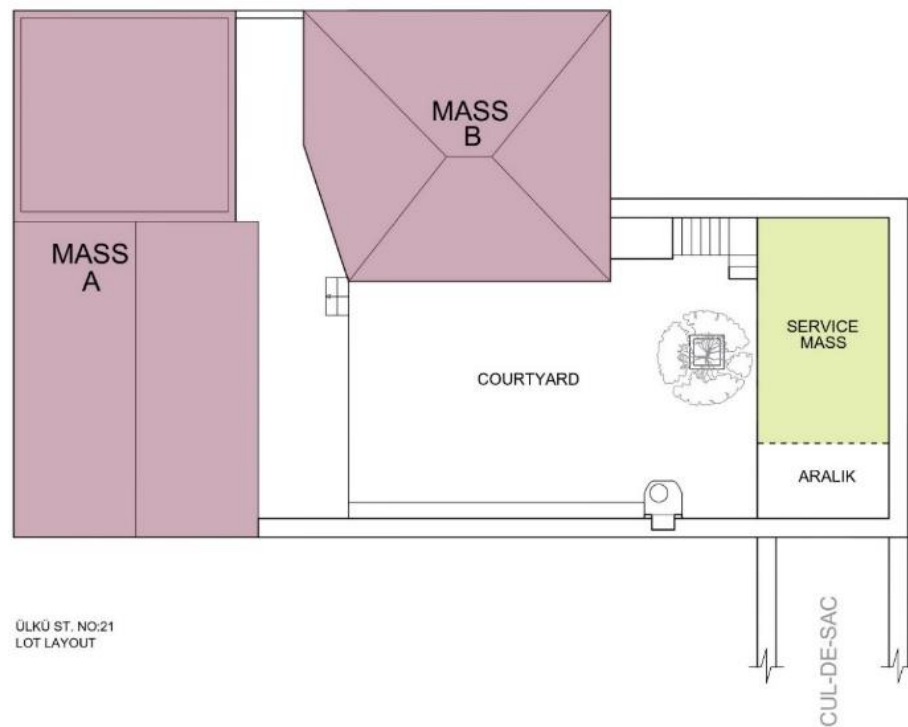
Ülkü-21 House lot layout around the the courtyard
